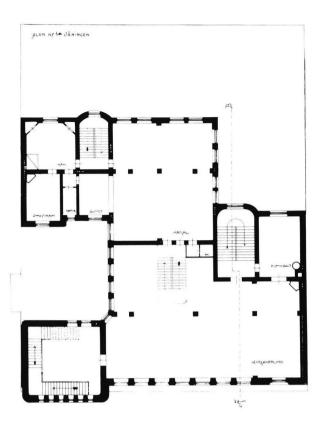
Final drawings, 1903. Fourth floor plan. The dining hall towards the rear of the lot was finally executed with a single bearing concrete pillar. (HKRVVA).
